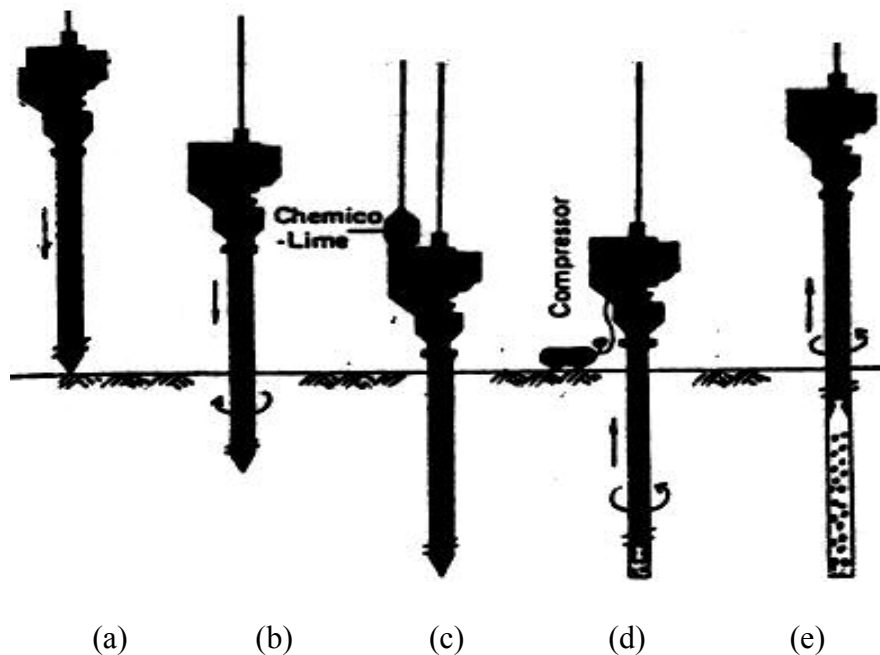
Construction Stages of Lime Column (a) Casing Placement (b) Drilling (c) Chemico Lime Installation (d) Casing Reversal (e) Lime Column (Kitsugi and Azakami, 1982)
